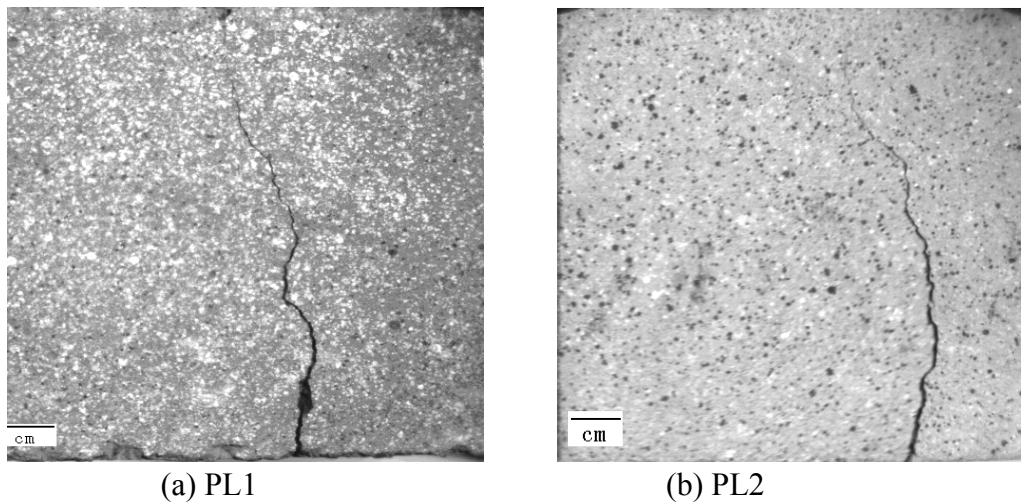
Crack paths on the surfaces of PL1 and PL2 specimens
